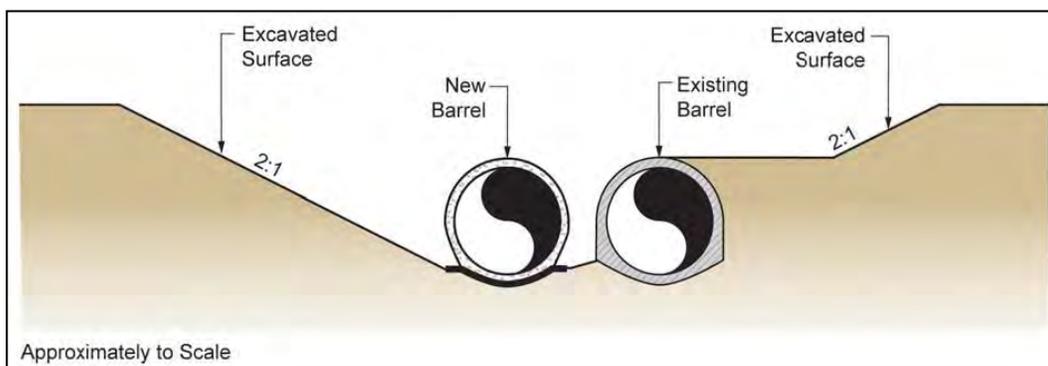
9. Siphon Second Barrel Addition—Typical Cross-Section
